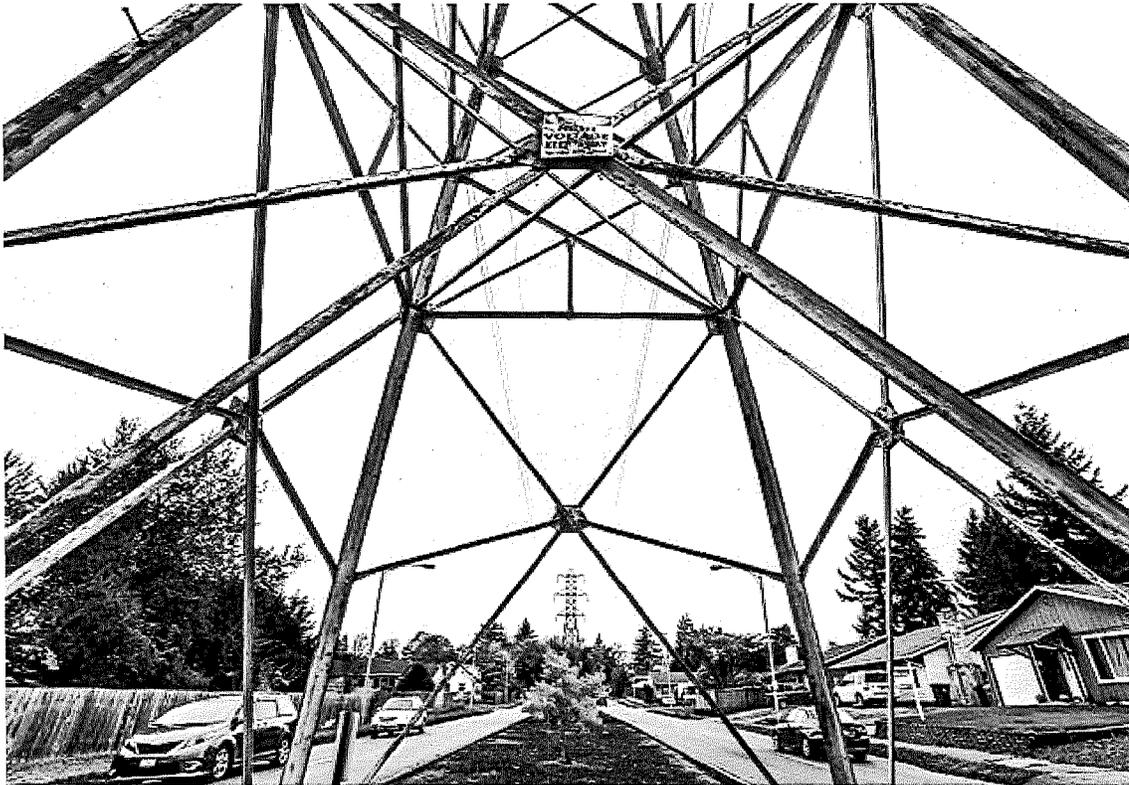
Adam Street Substation, with tower 1 in background, view northeast
